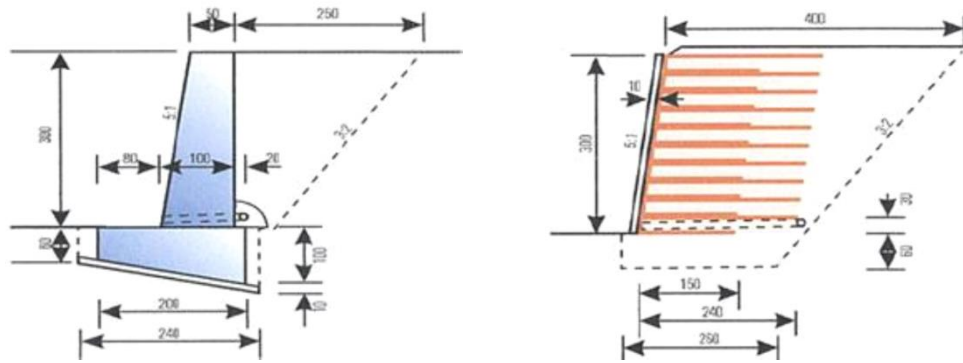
Schematic cross-section of retaining walls: the reinforced concrete wall (CASE 4A, left) versus the geosynthetic reinforced wall (CASE 4B, right)
